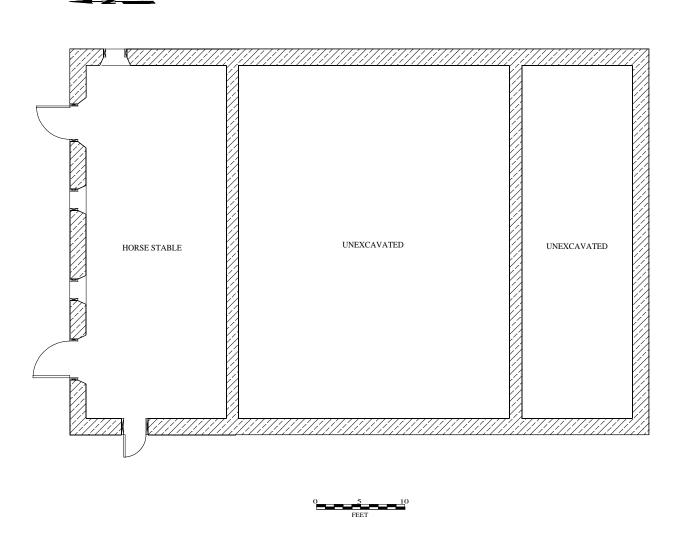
Basement floor plan of the Howarth Barn. The buttresses that were added at a later date to bolster the north wall are not illustrated on this figure (FRR 2001).
